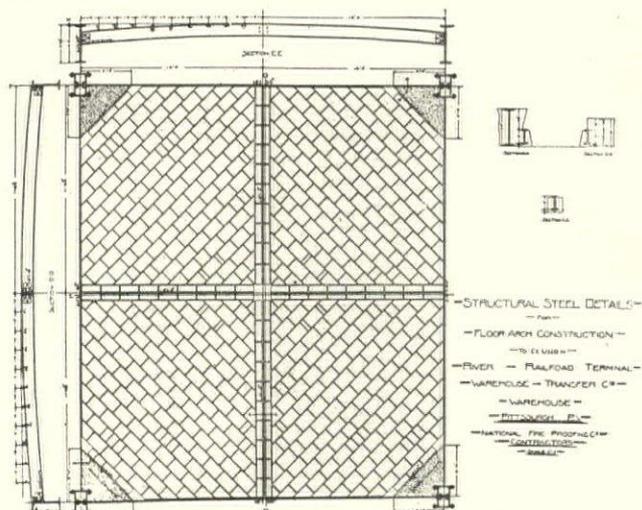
PLAN AND SECTIONS OF ONE FLOOR-PANEL, SHOWING CONSTRUCTION OF THE PITTSBURGH TERMINAL WAREHOUSES, PITTSBURGH, PA.
